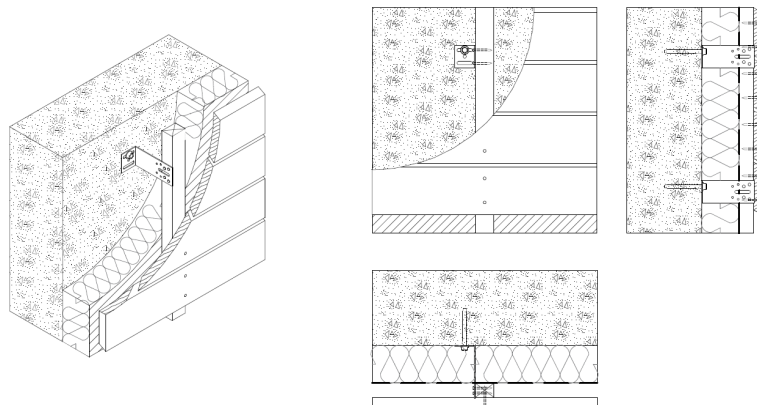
Horizontal external timber cladding on vertical battens fixed on concrete wall with angle brackets
